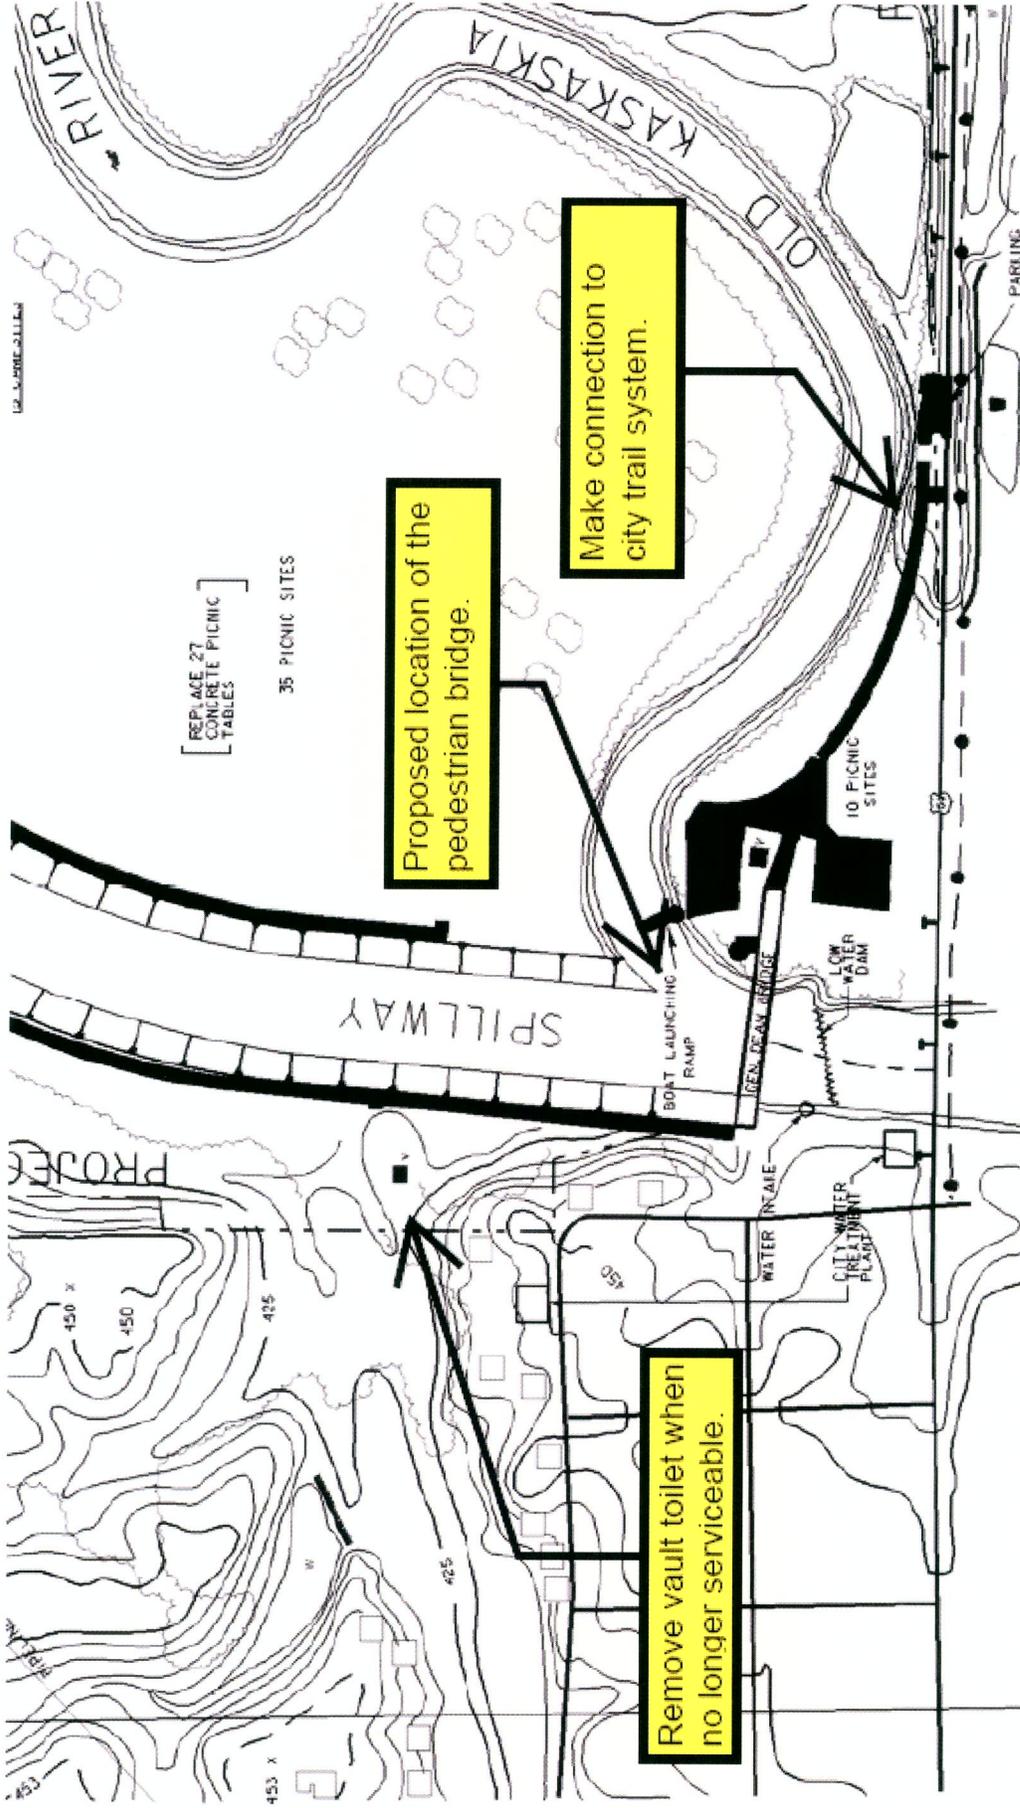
General Dean Bridge and West Spillway Recreation Areas
